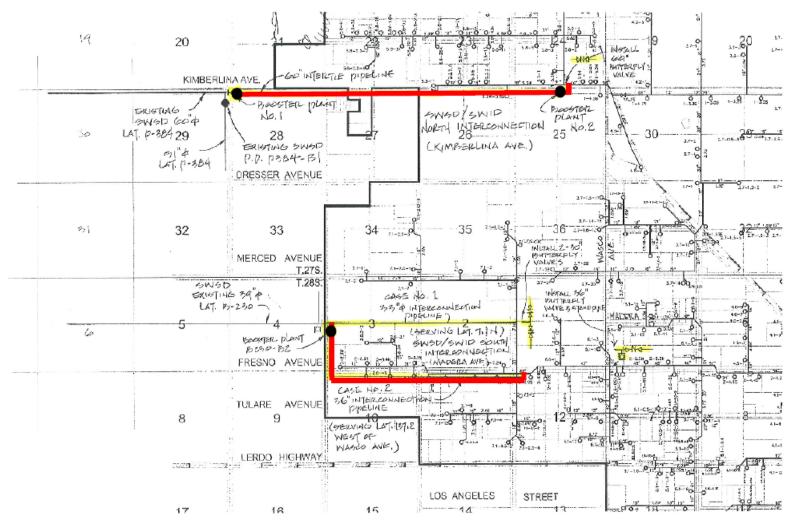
Proposed Kimberlina Road and Madera Avenue Interconnections between Semitropic Water Storage District and Shafter-Wasco Irrigation District
